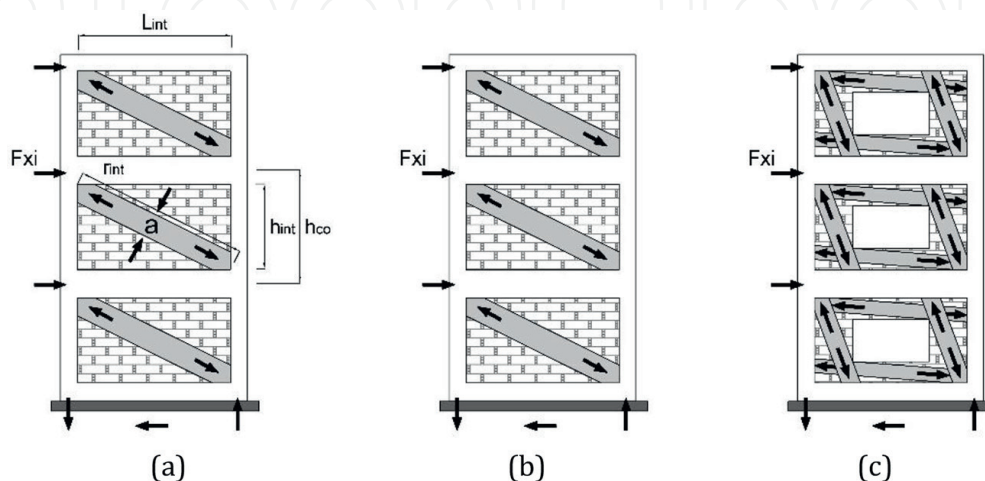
(a) Concentrically located compression strut analogy, (b) eccentrically located compression strut analogy, (c) compression strut analogy in infill walls with openings.
